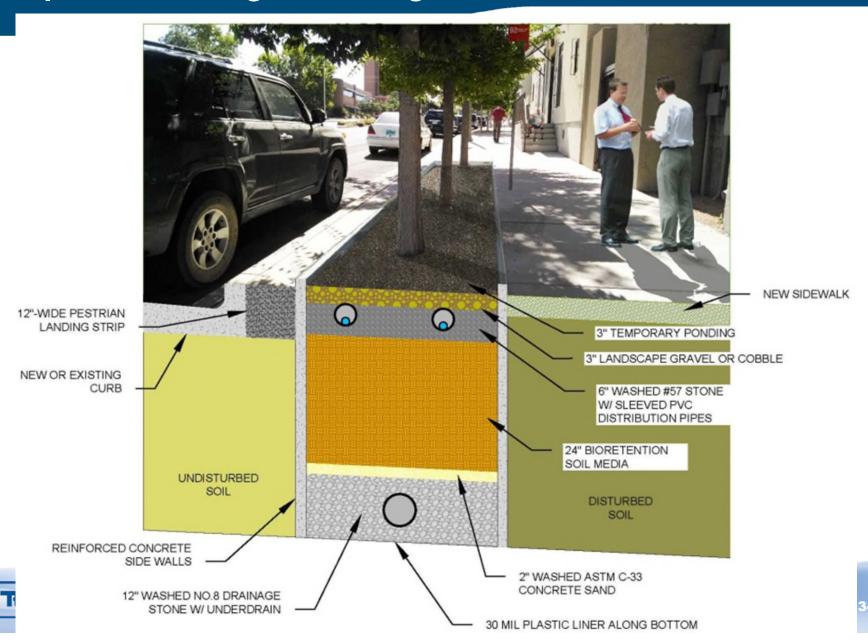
SCENARIO 3 PLANTER BOX SECTION W/ SUSPENDED PAVING TREATMENT
